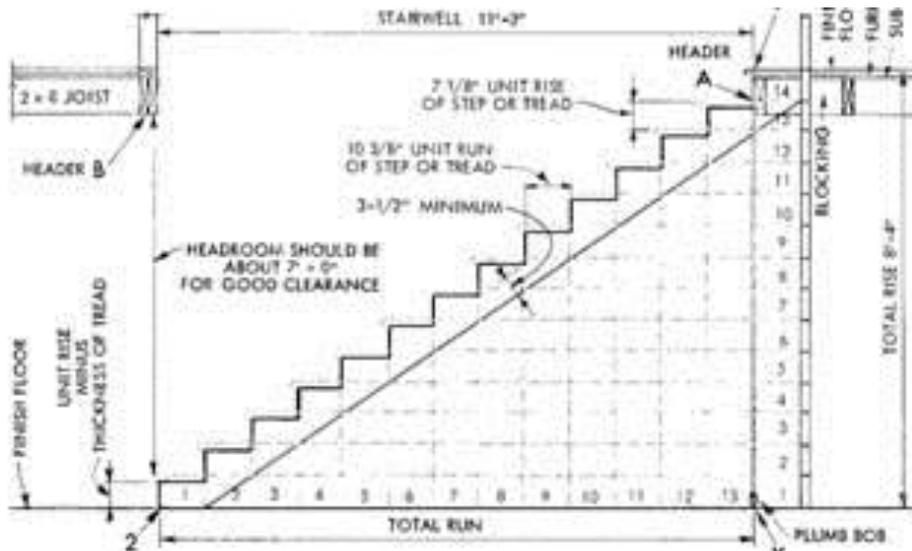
Typical riser and tread dimensions to cover a height of 8.33 feet.
